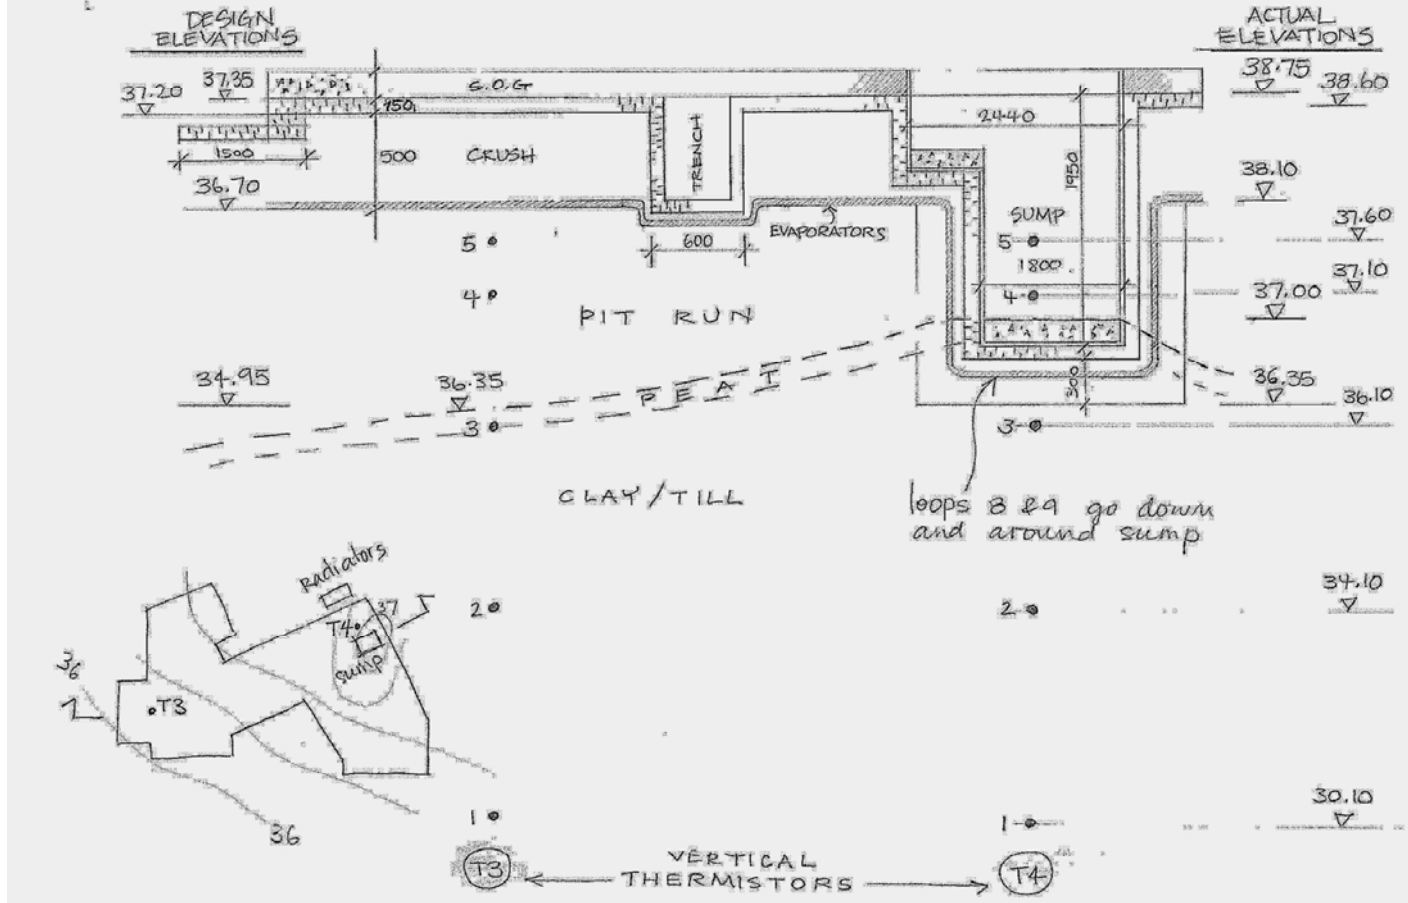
Schematic of the foundation pad cross section (Public Works & Services files)
